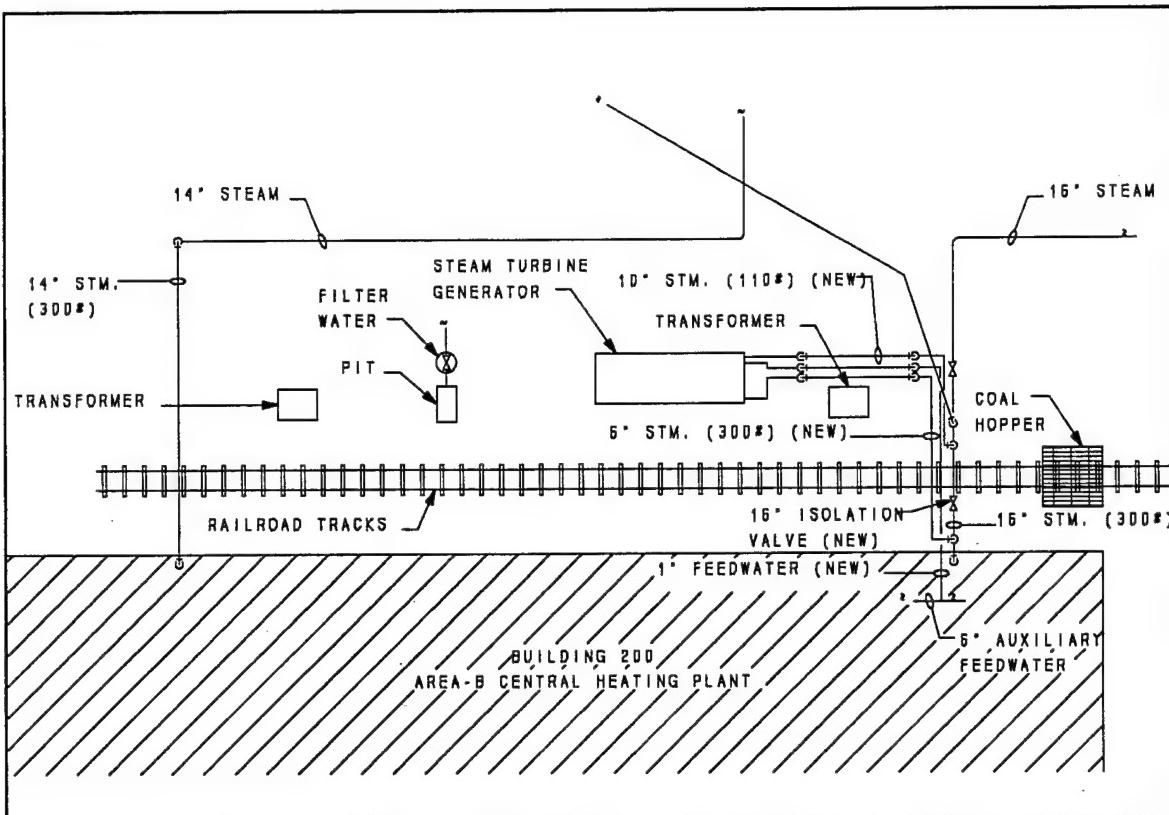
STEAM TURBINE-GENERATOR PLANT SITE
